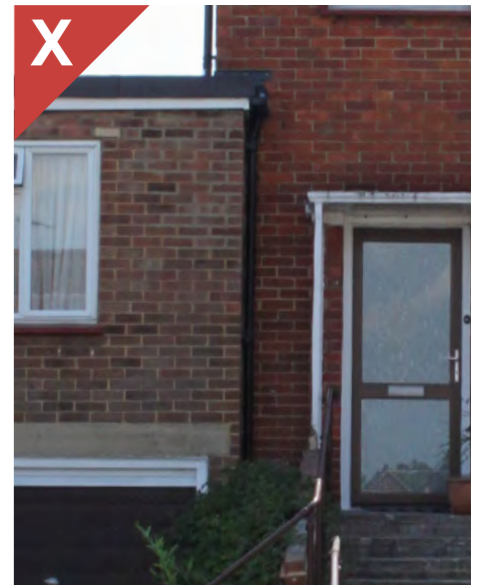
An example of a side extension that attempts to match the existing brick work but fails to do so.
